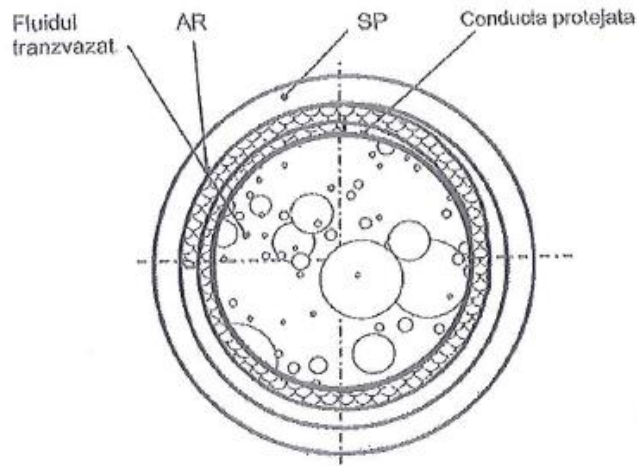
Transversal section in a pipe provided with electric resistances assembly and the mechanical and thermal protection layer of the assembly
